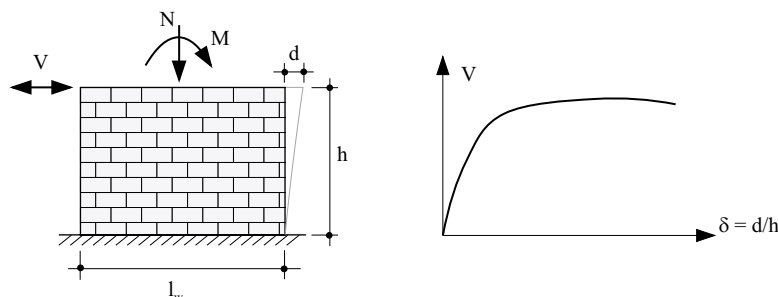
Test on unreinforced masonry wall elements (piers)
